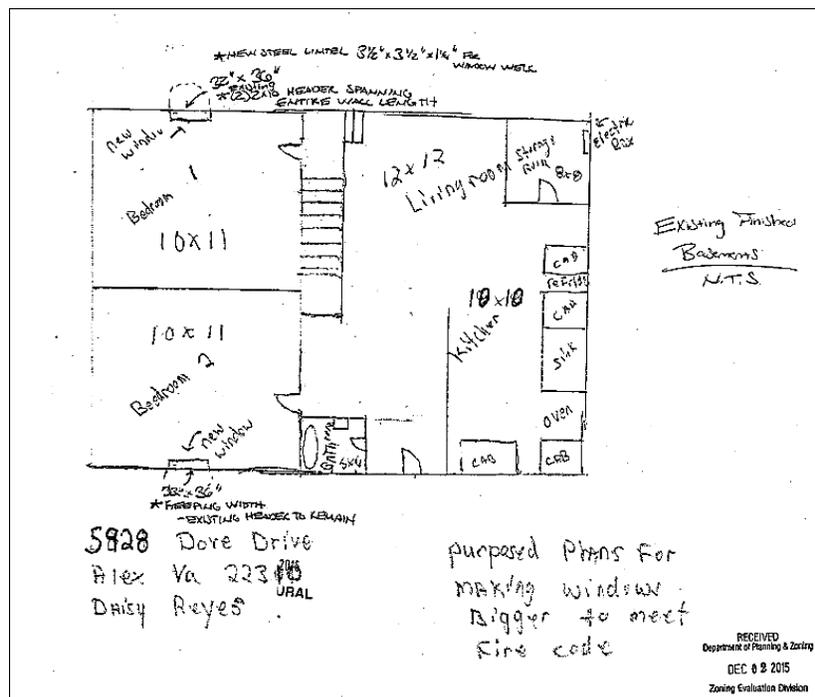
ADU Floor Plan (Source: Building Permit for Window Wells)
